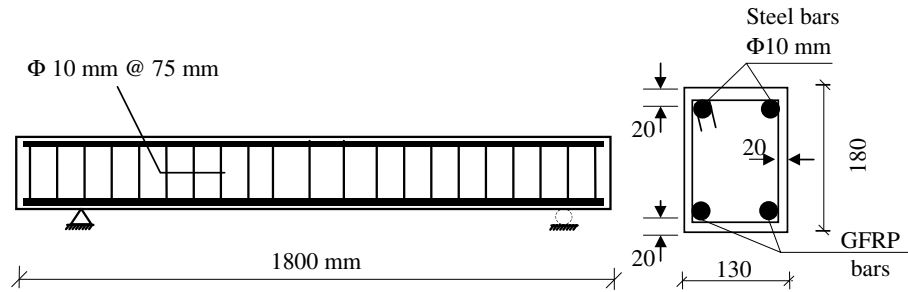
Concrete dimension and reinforcing details for the tested beams.
